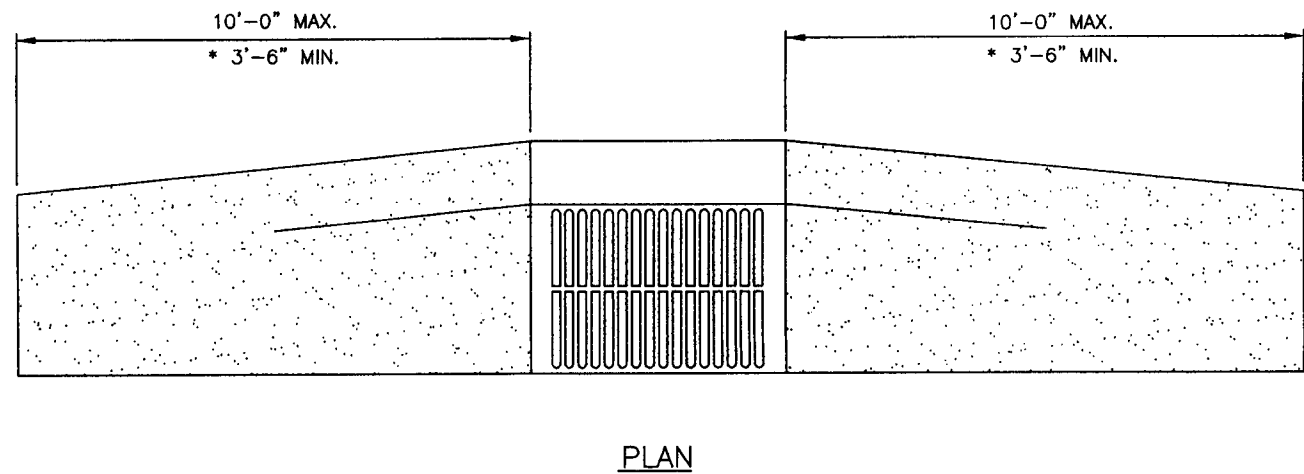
DETAILS SHOWING EXPANSION JOINTS IN CONCRETE SIDEWALK
